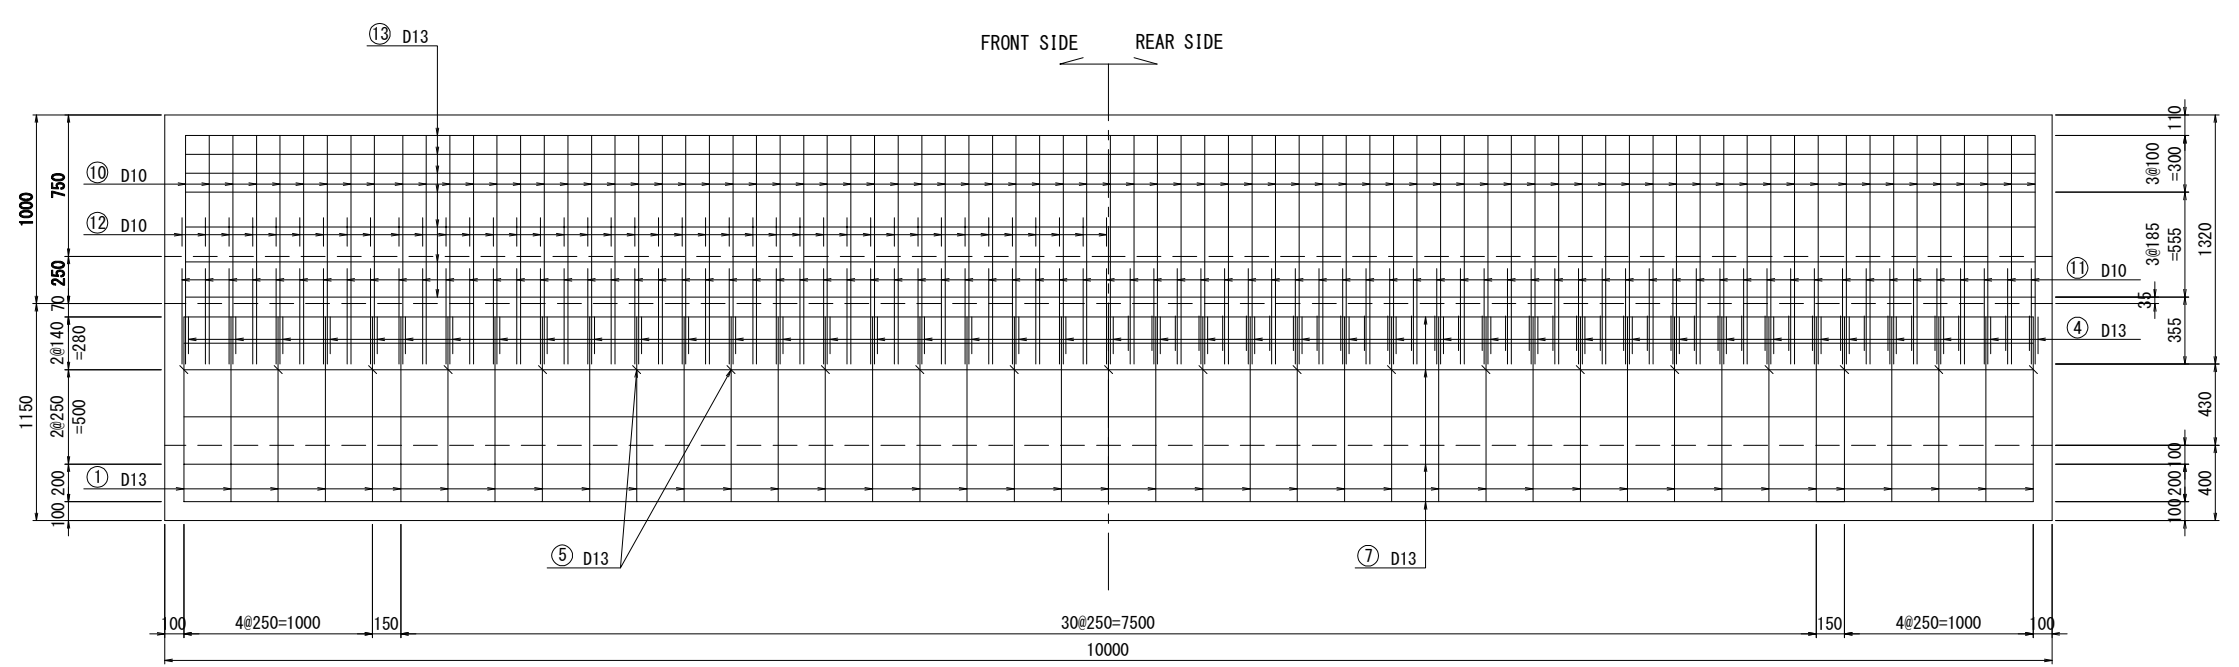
# DETAIL OF CONCRETE BARRIER ON MECHANICALLY-STABILISED EARTH WALL(1) S=1:40
